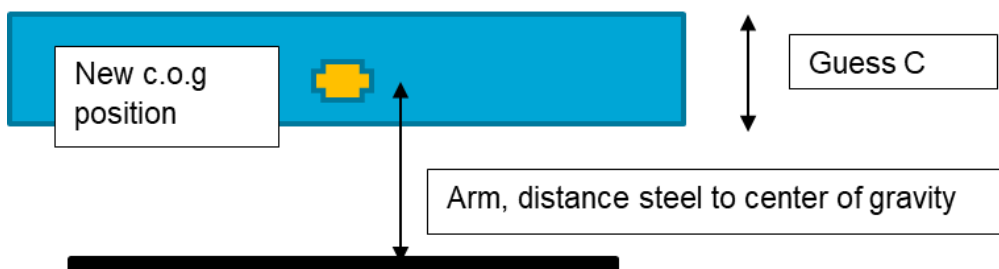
Cross section after concrete in tension is removed, and steel section area is transformed to equivalent area of concrete
